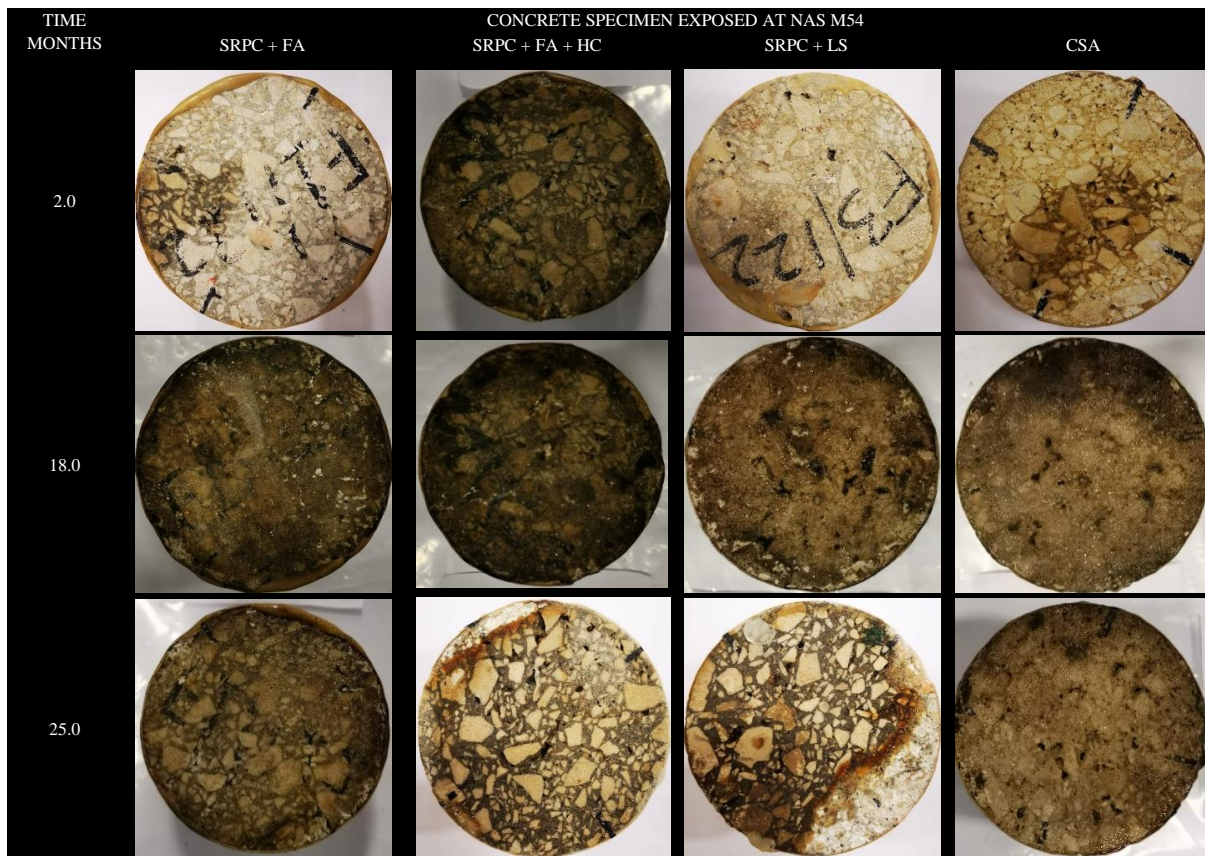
Visual observation of LH concrete specimens exposed at NAS manhole 54 for two years
